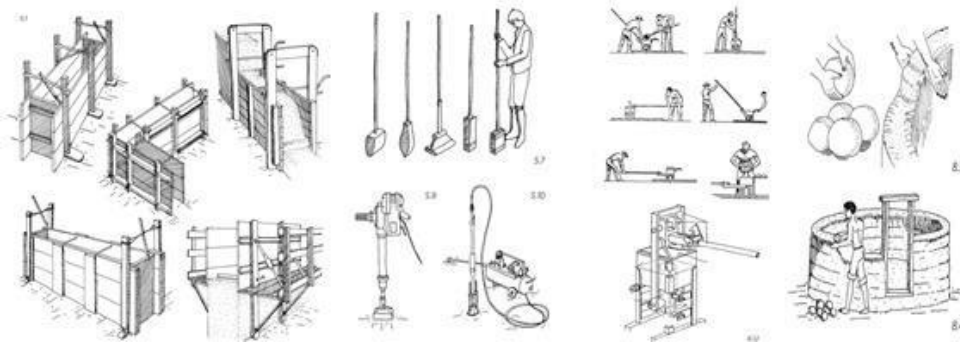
Earthen architecture's construction techniques; rammed earth formwork and tools, production of compressed earth blocks and sculpting earth by hands (Minke, 2006).
